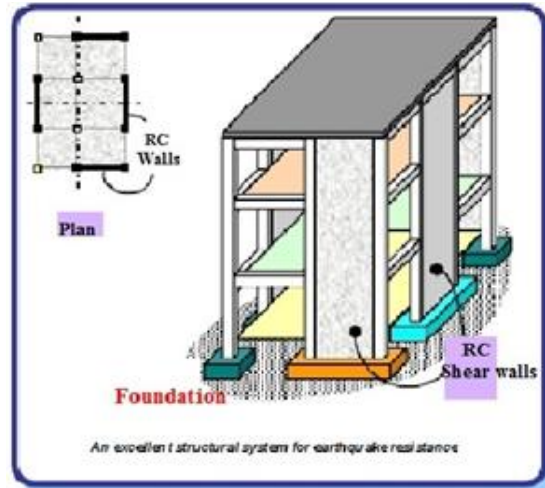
Typical Floor Plan Of A Shear Wall - Frame Building Structure
